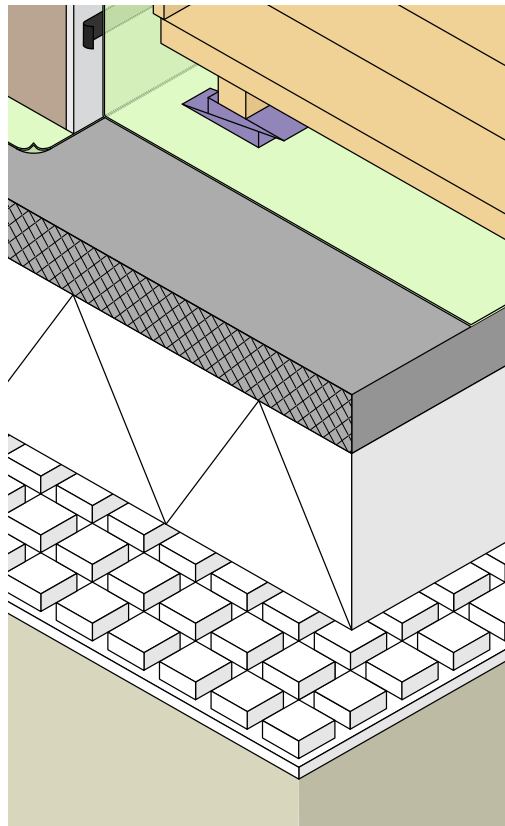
The EPS element used as the integrated capillary-breaking layer and radon-suctioning layer of a traditional ground slab floor. The ground slab floor was constructed of a concrete slab on top of a thermal insulation layer above the element, that works as the integrated capillary-breaking layer and the radon-suction layer, mounted on stable ground.
